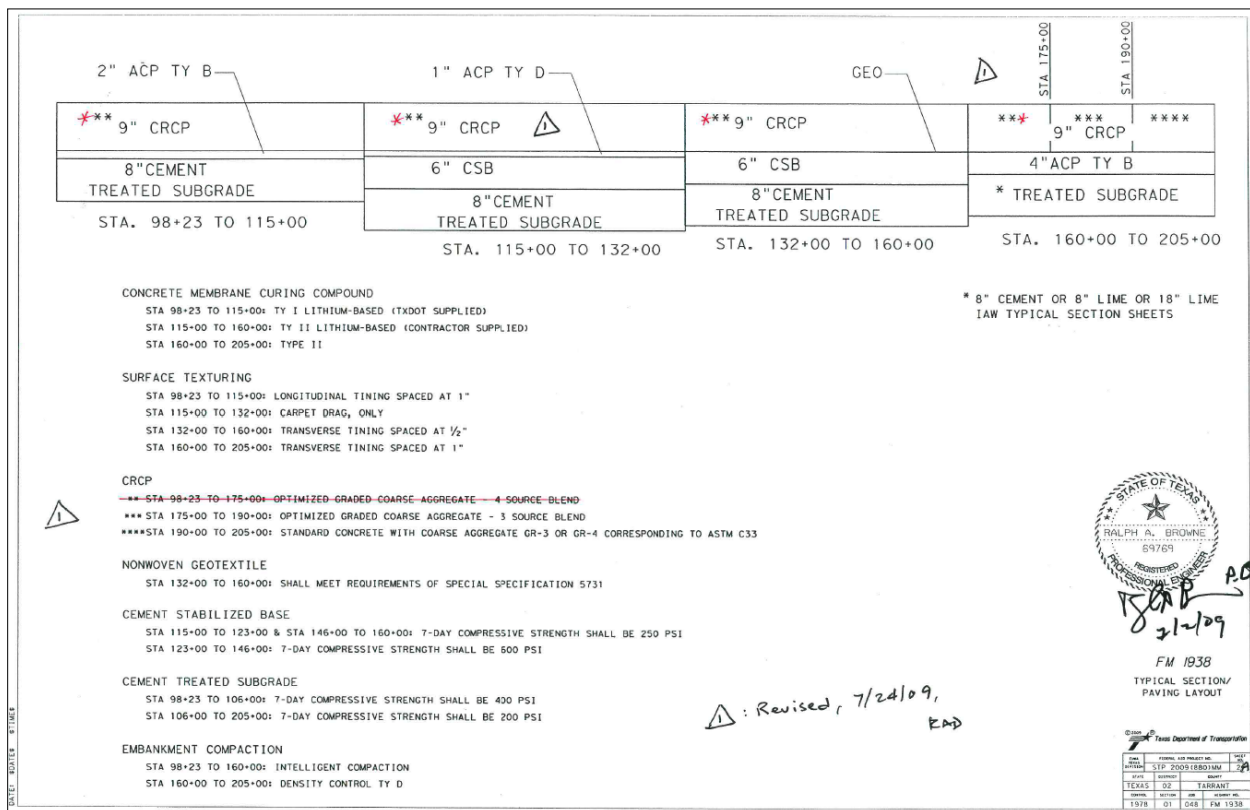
Plan Sheet – FM 1938 Layout with Feature Descriptions.
